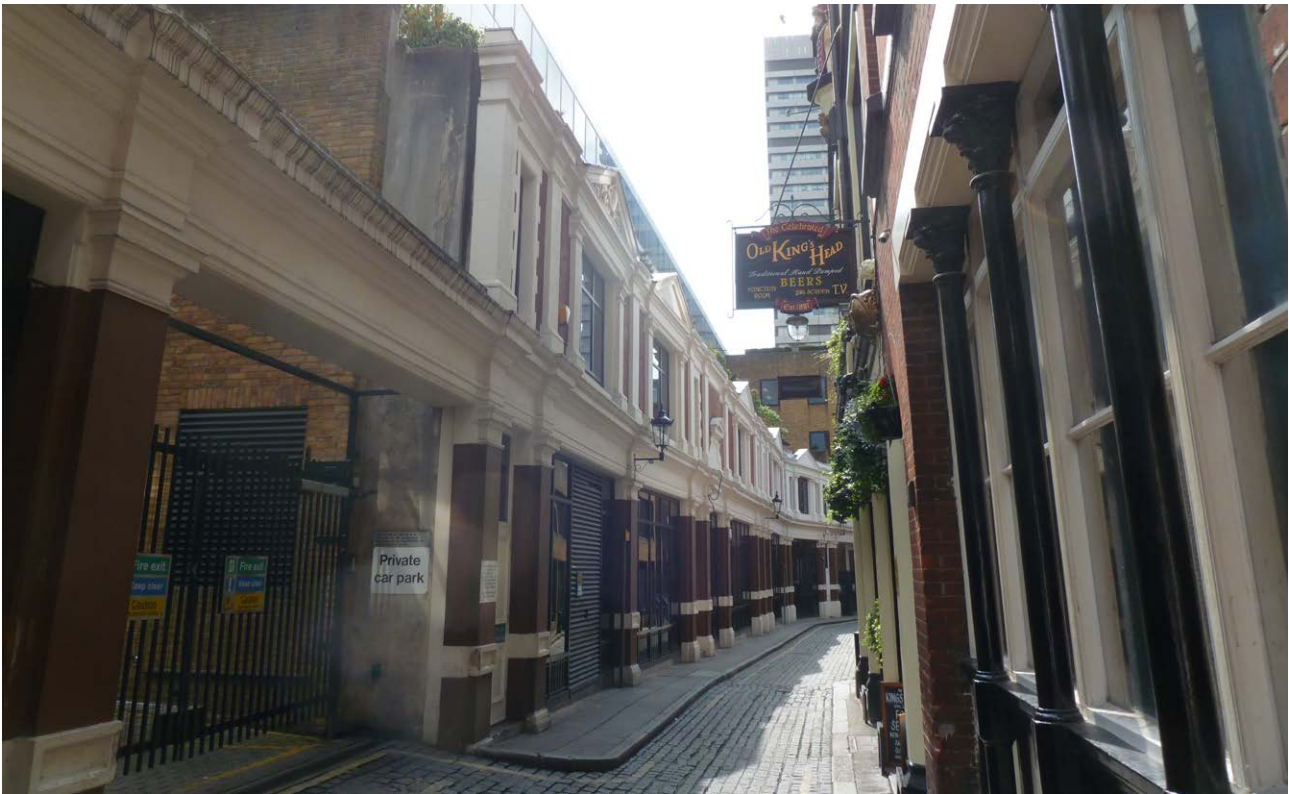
View of the existing open car park / servicing access and adjacent UKPN transformer room / with louvred façades.
